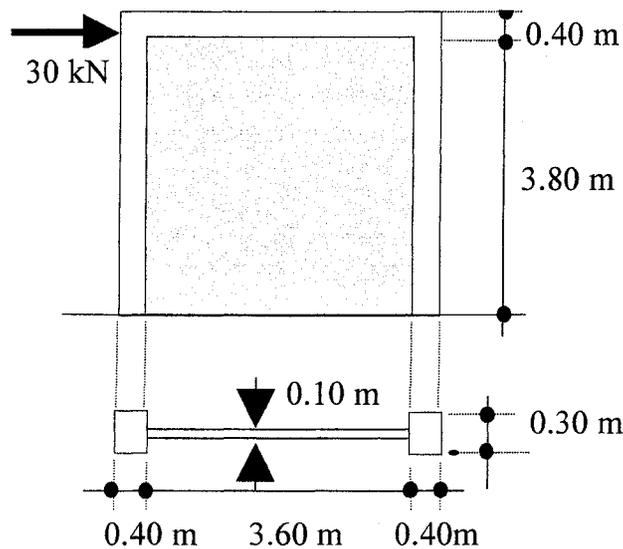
Geometry and loading of the one-story / one-bay brick masonry infilled frame
